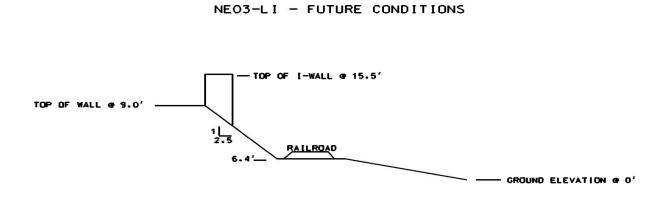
Typical Levee Design Cross-section New Orleans Lakefront Airport – East Levee (NE03-LI)
